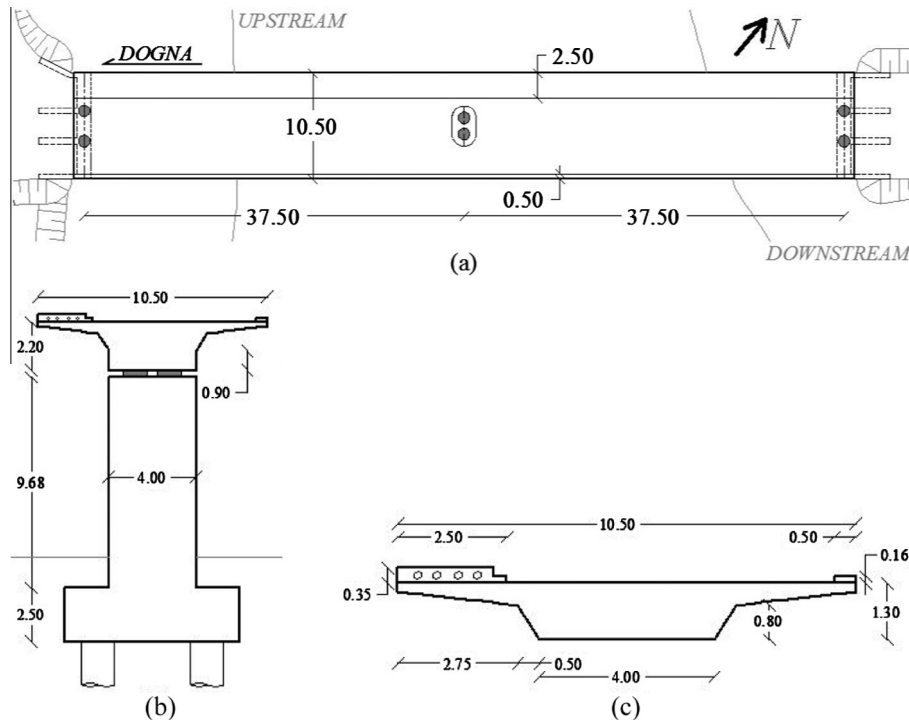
Dogna bridge: (a) plan; (b) cross-section on the pier and (c) typical deck cross-section. Dimensions in meters.
